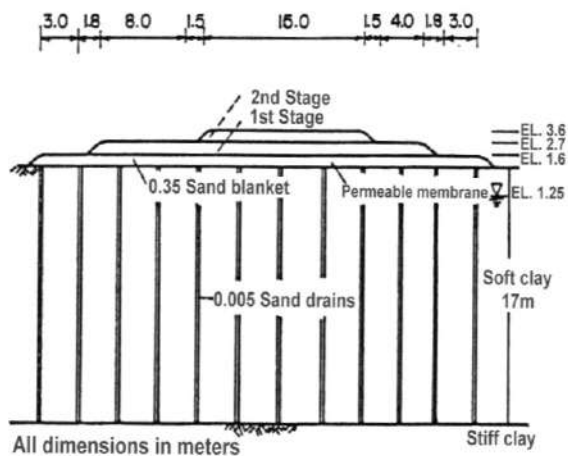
Elevation of test embankment at RTN Dockyard site (Balasubramaniam et al. 2005)
